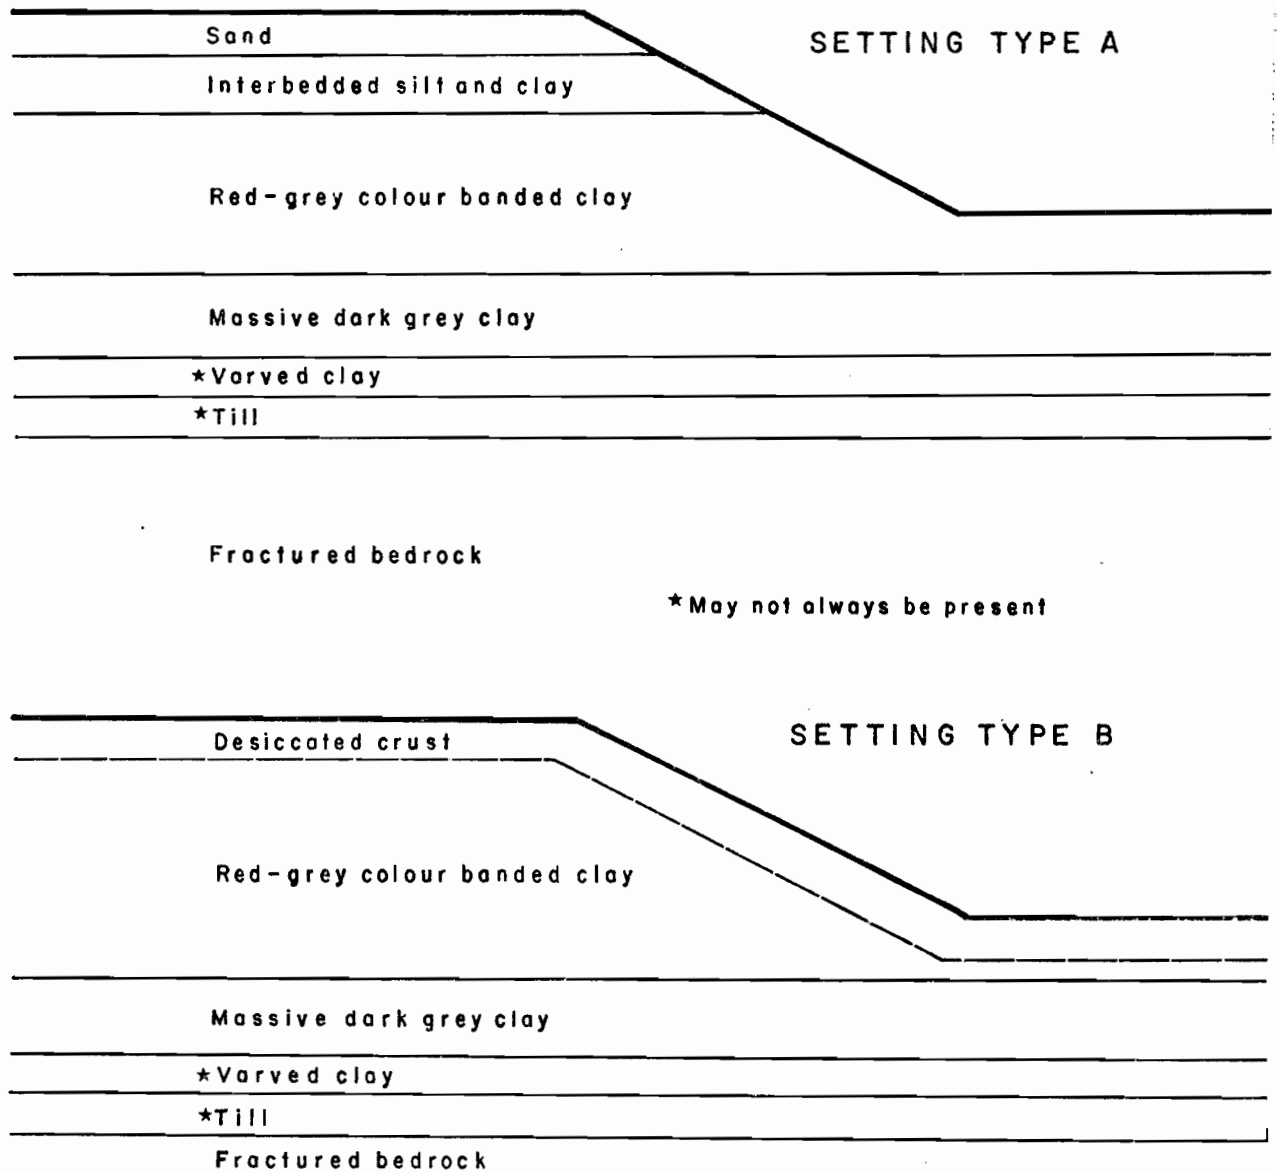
TWO TYPICAL SLOPE SECTIONS
